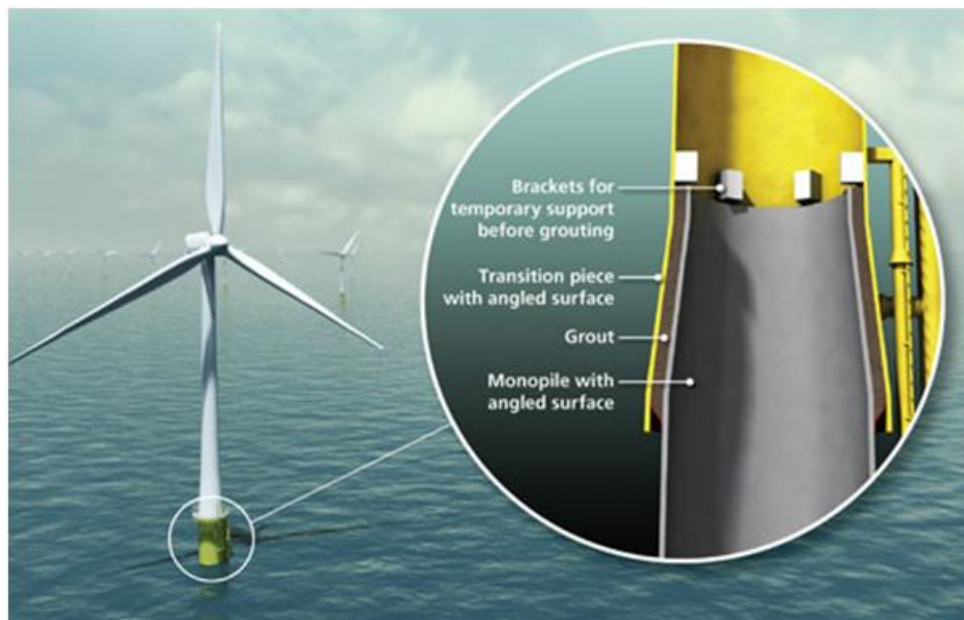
Recommended transition piece connection with conical grouted section (DNV)
